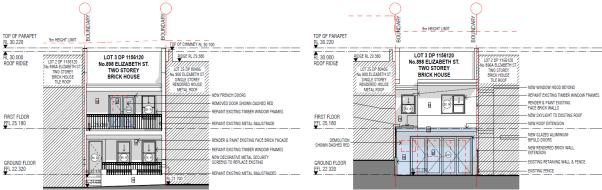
Proposed front (left) and rear (right) elevations of the terrace
